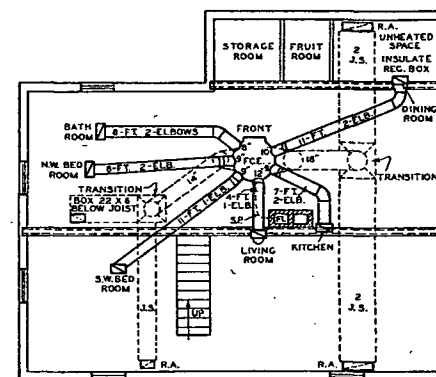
TYPICAL BASEMENT LINE DRAWING
